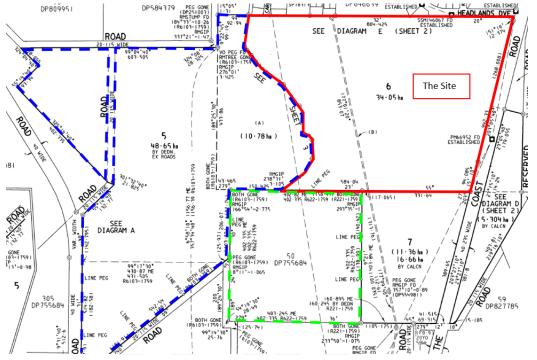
Site of proposed DA subdivision works (red) and DA related sewer and reticulated water works (green and blue)
